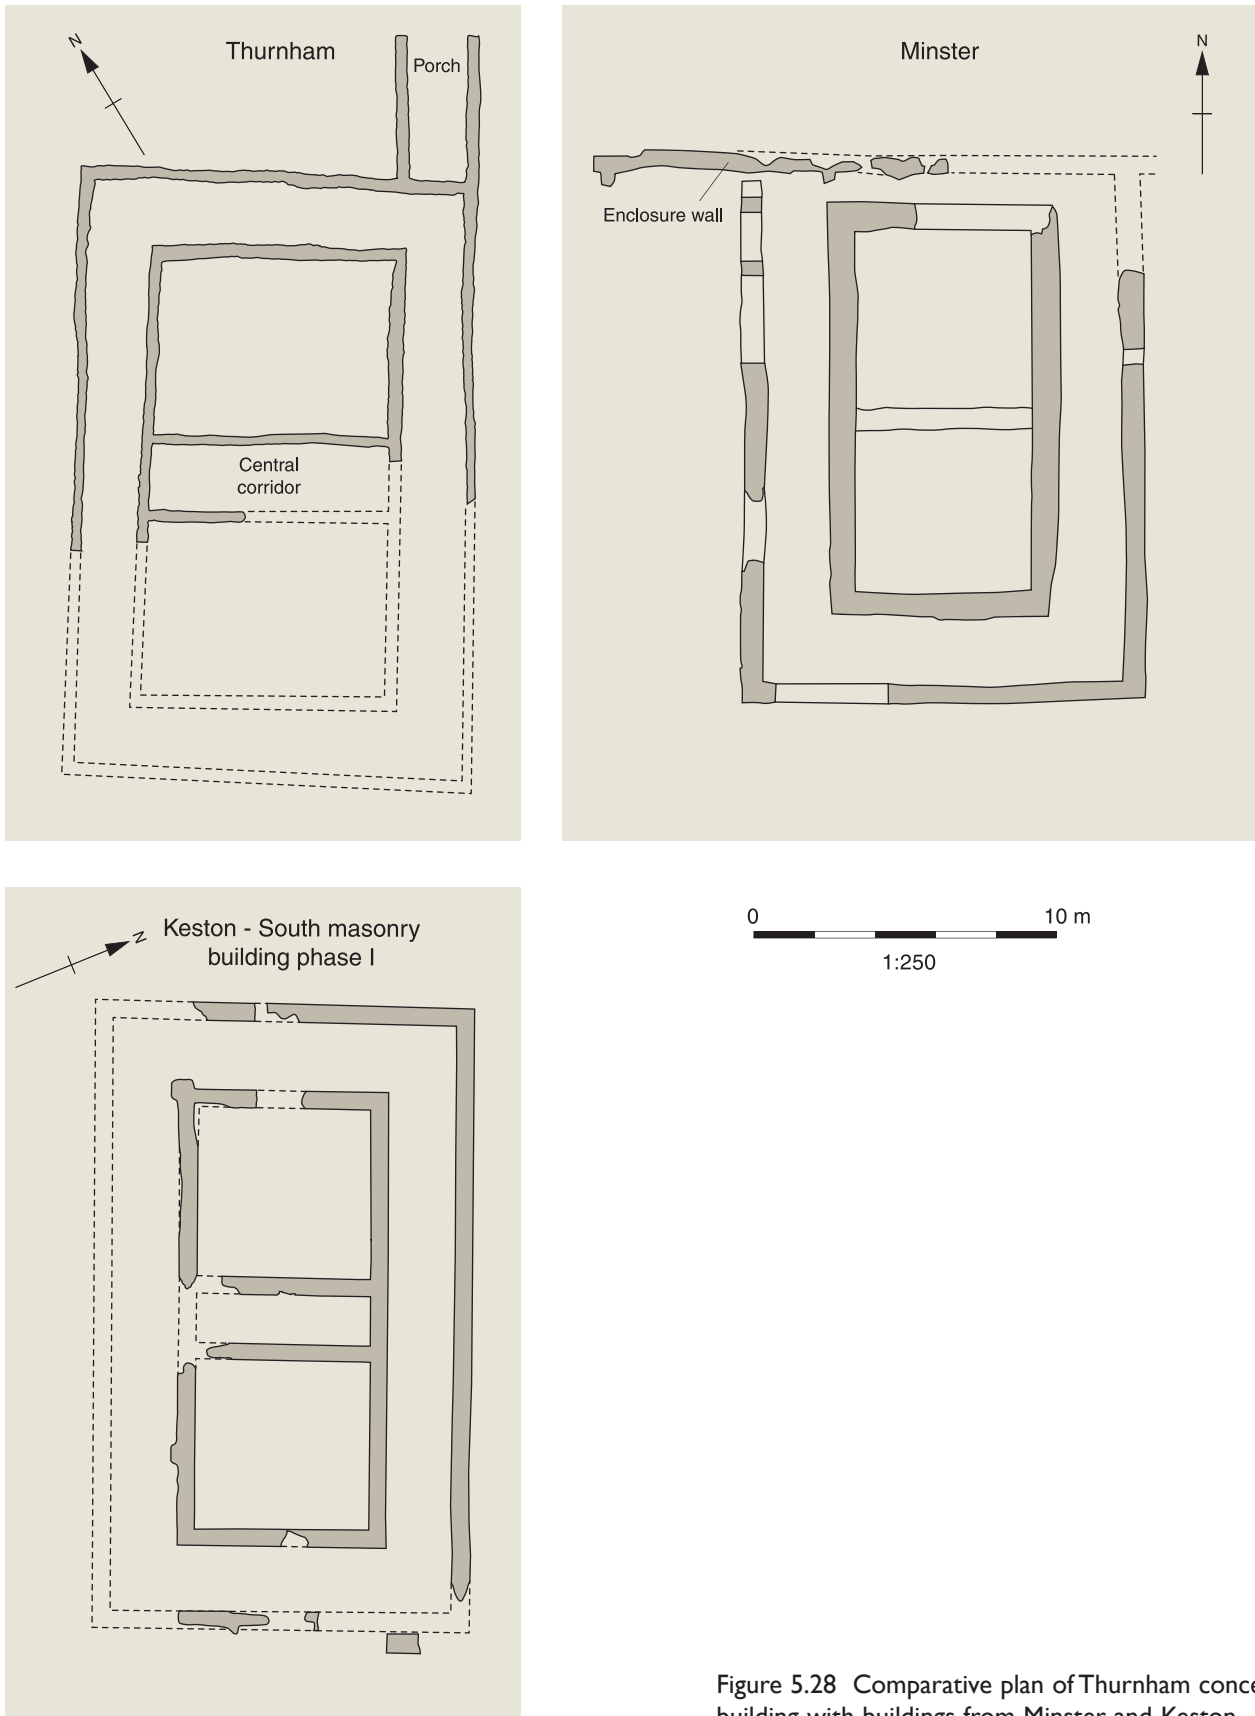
Comparative plan of Thurnham concentric building with buildings from Minster and Keston
